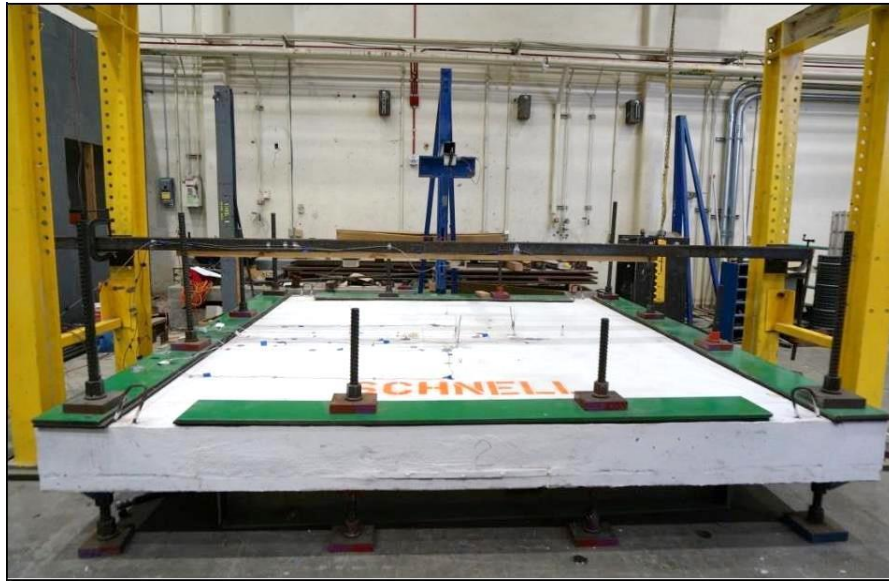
Experimental Setup for Sandwich Slab Specimens A and B
